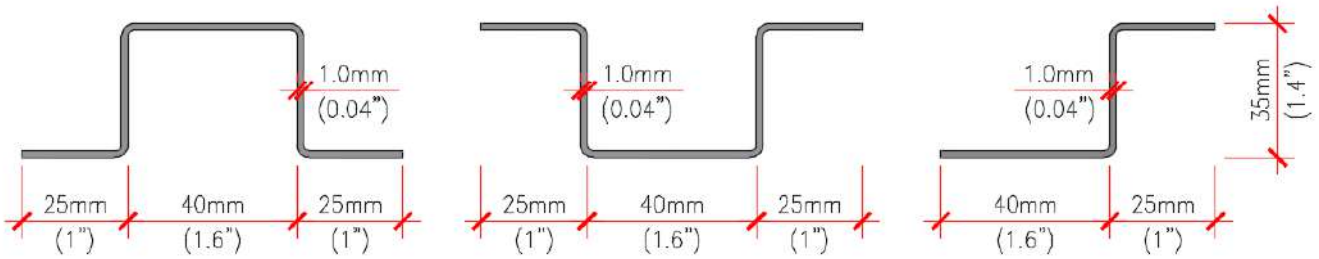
Section type of structure in galvanized steel DX51D (Z+)
